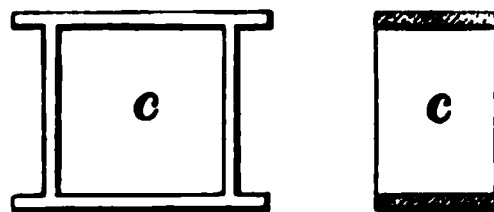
Door-frame of cast-iron, in front elevation and section.
